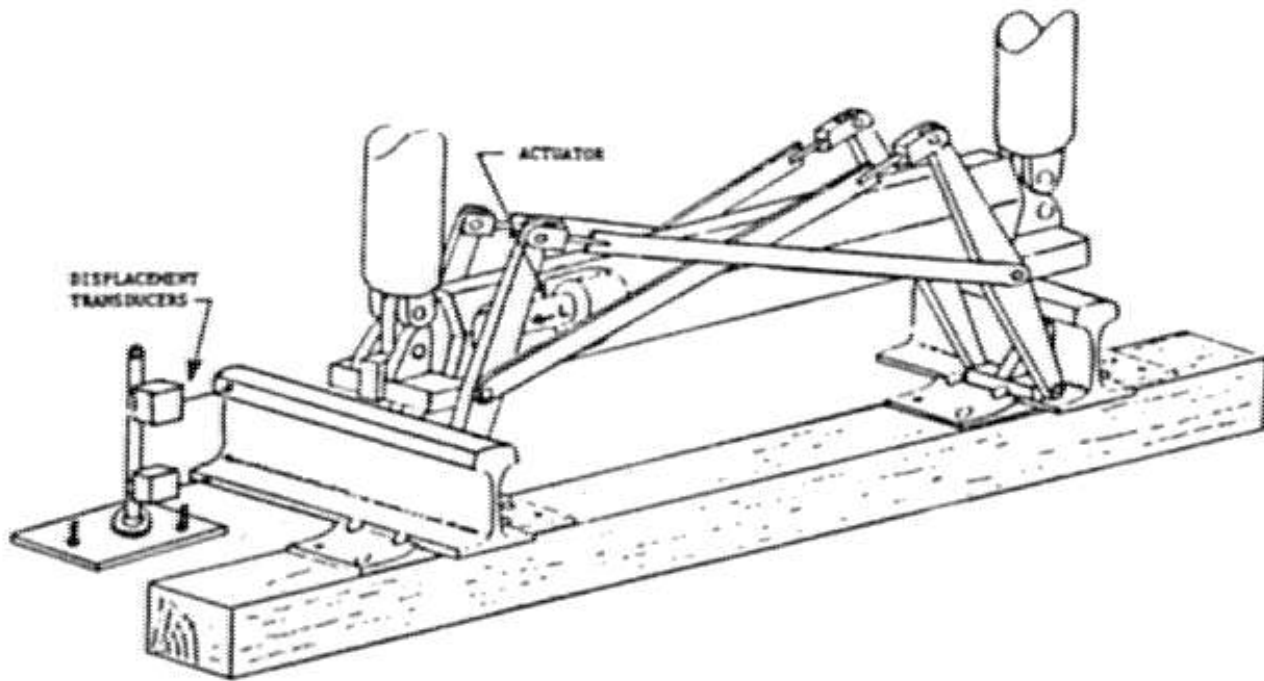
MODIFIED BASIC LAYOUT OF TRACK LOADING FIXTURE
